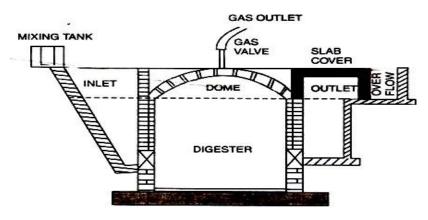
FIXED DOME TYPE BIOGAS PLANT
